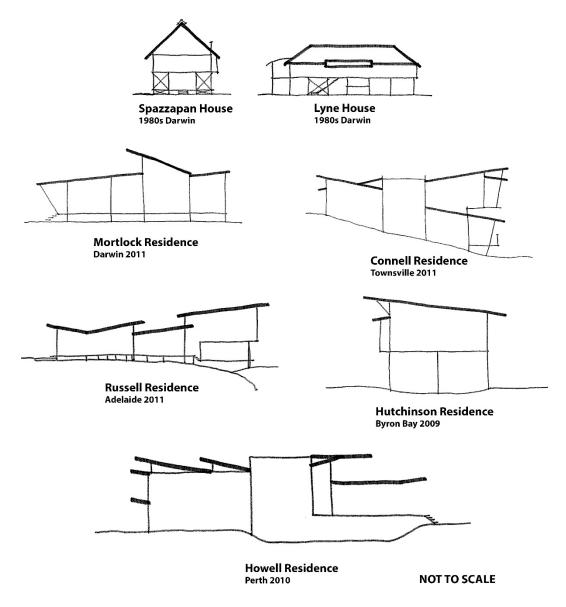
Schematic sketches of skillion roofs as a distinctive expression of contemporary Troppo houses in the later practices.
